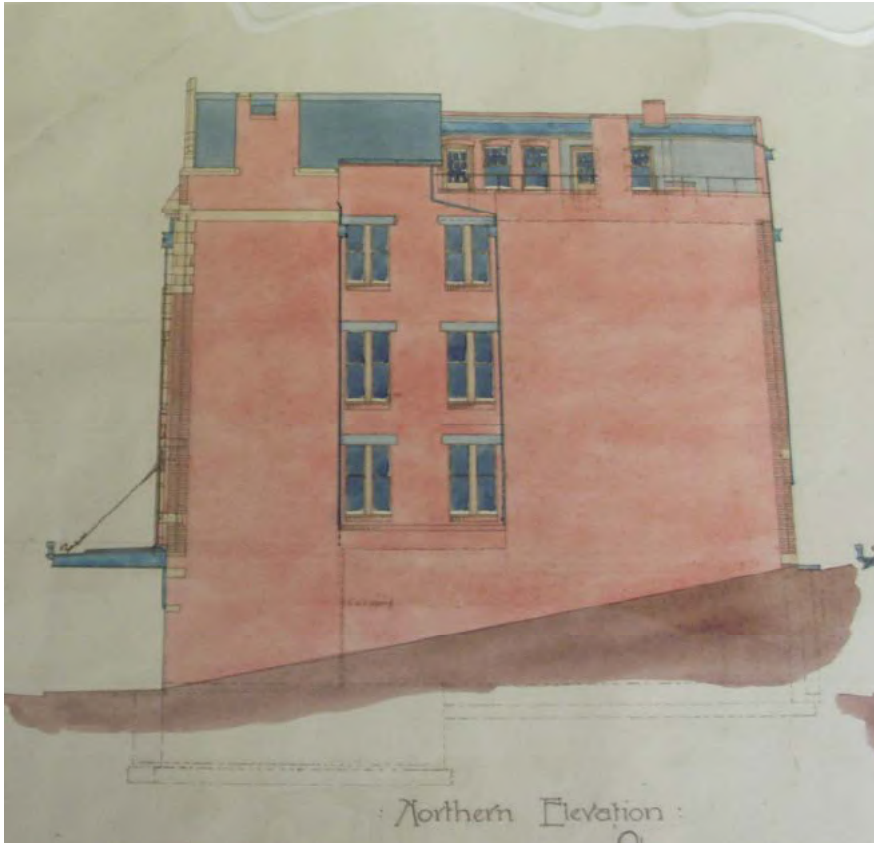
Northern elevation showing the recessed configuration of the northern elevation and the roof level accommodations
